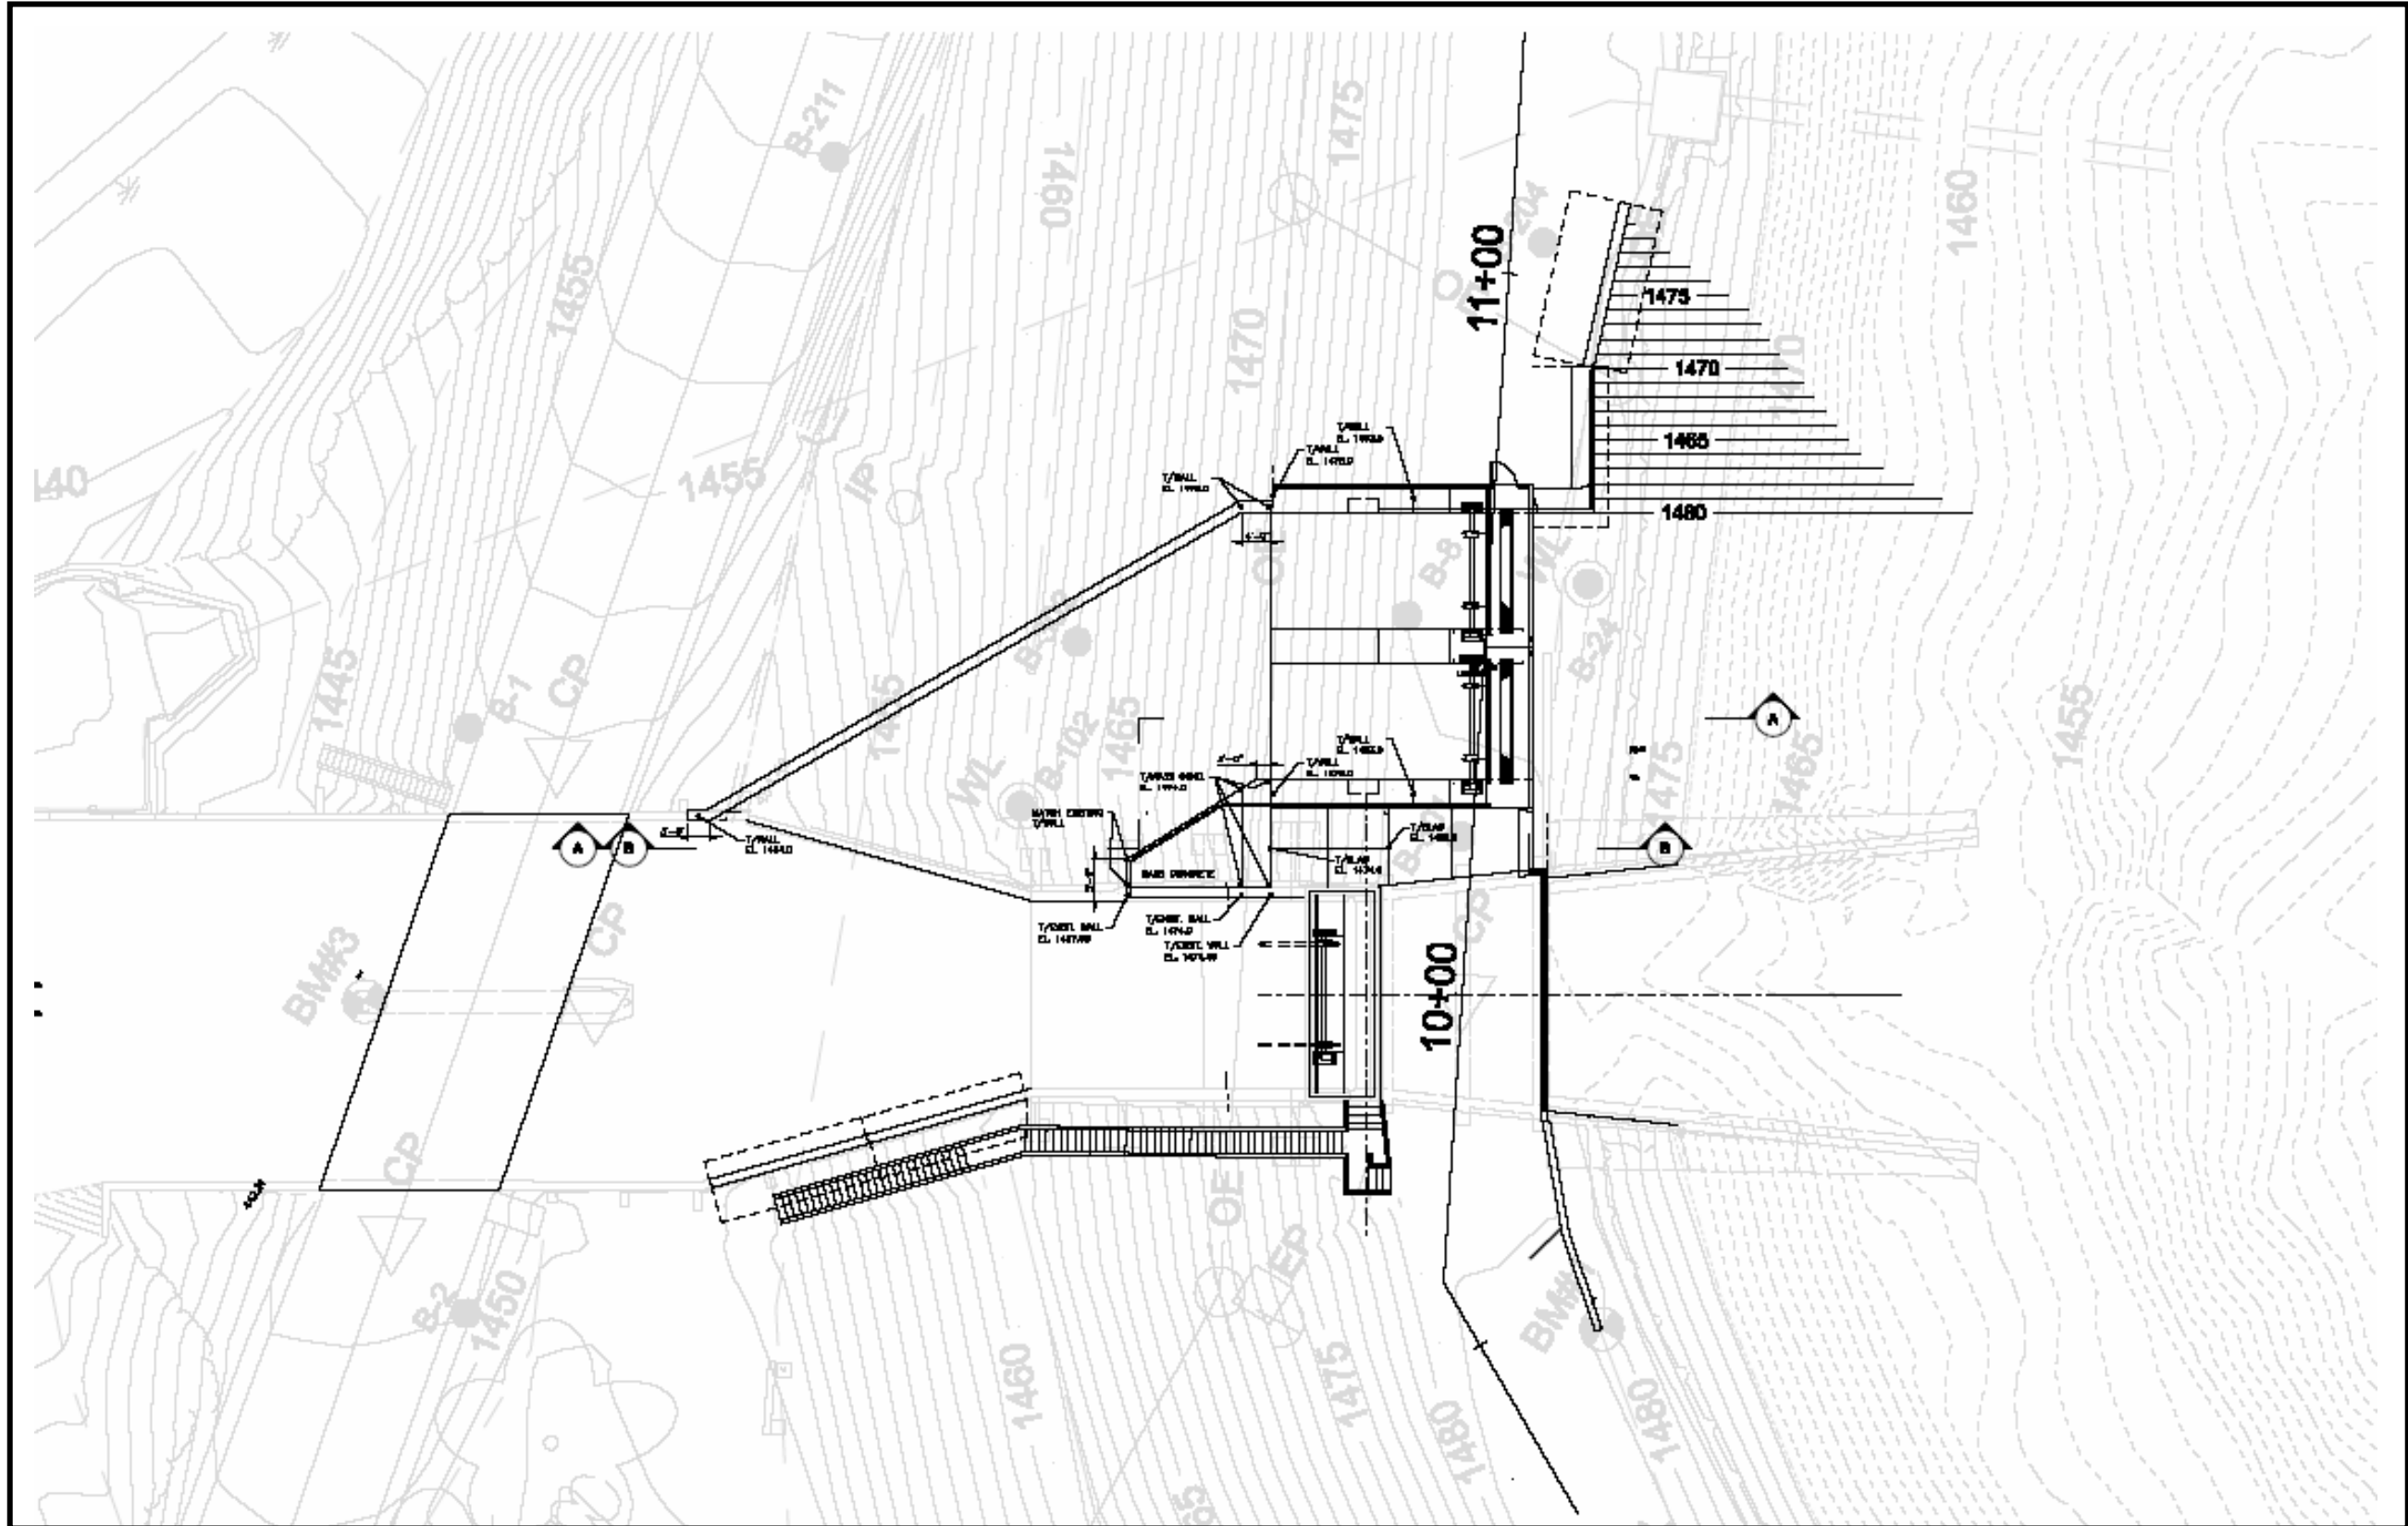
The prototype plan view of the spillway Design-1 Modified-1.
